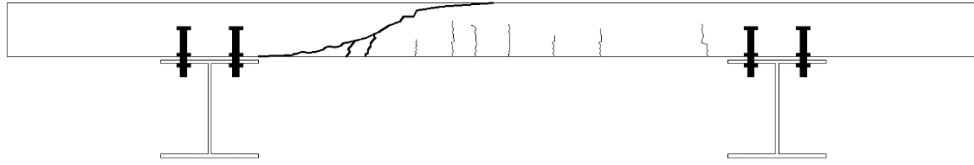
Crack mapping of bridge deck Prototype 3.
